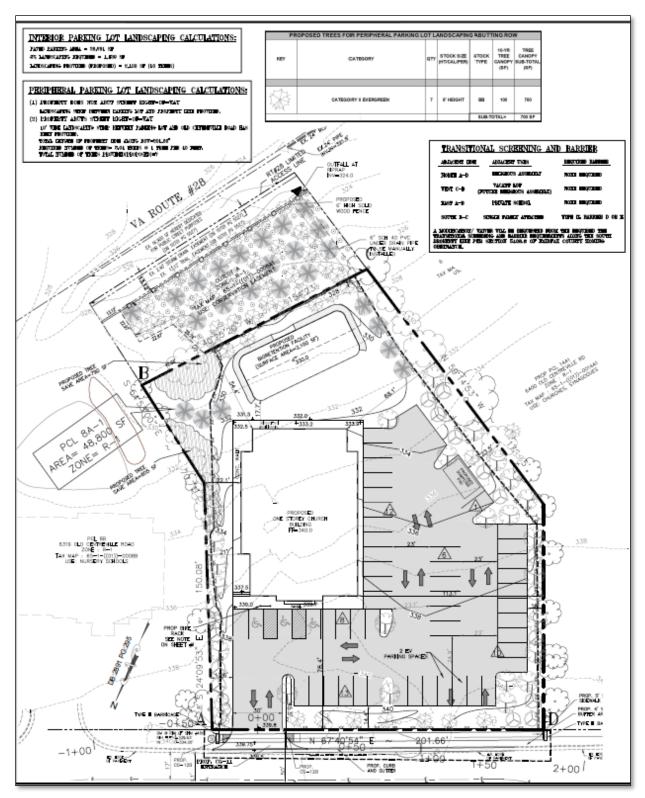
Excerpt of the special permit plat detailing the proposed landscaping plan Source: Applicant
